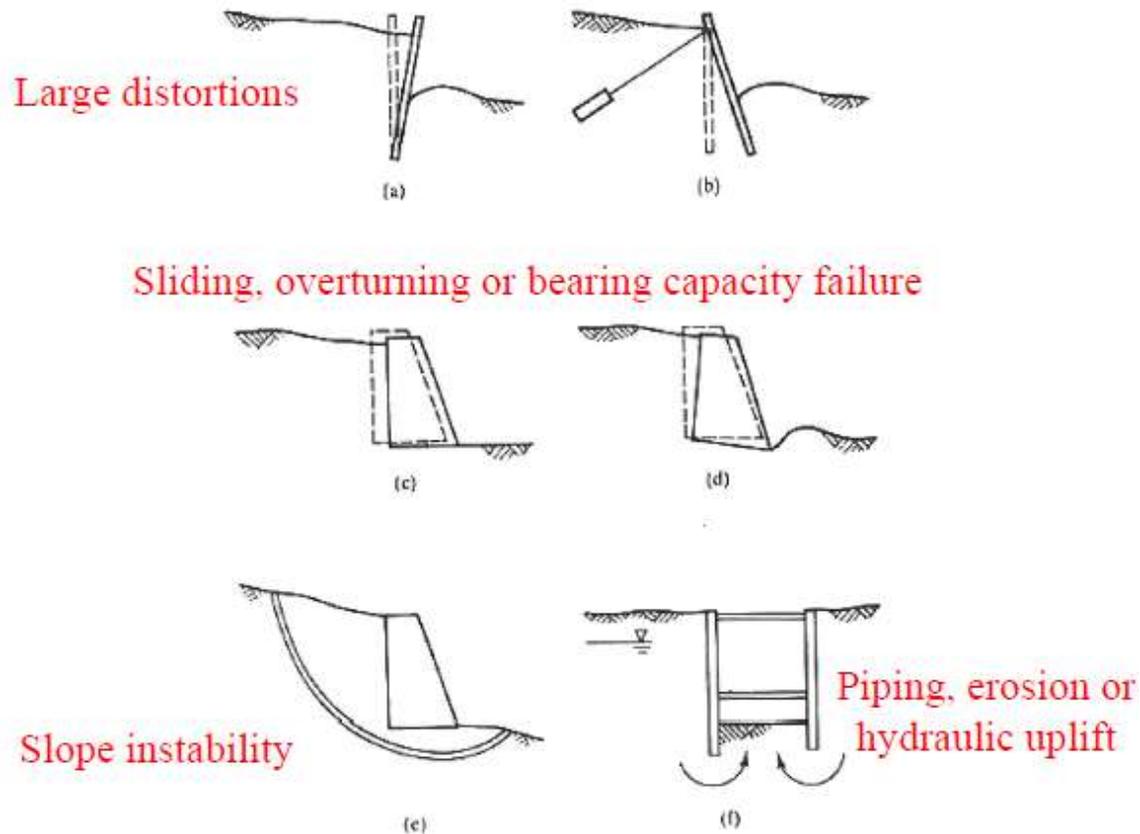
Mechanisms of failure of retaining walls ( Atkinson, 1993)
